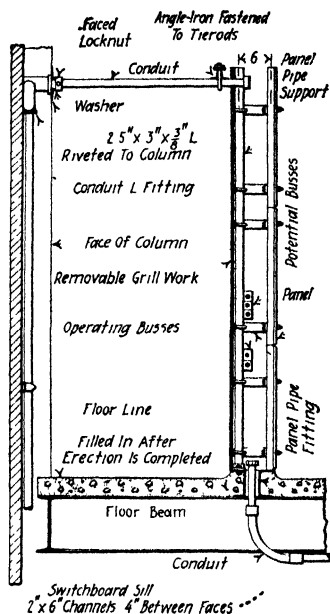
Arrangement of switchboard which permits the conduits to rise between two steel channel sills
